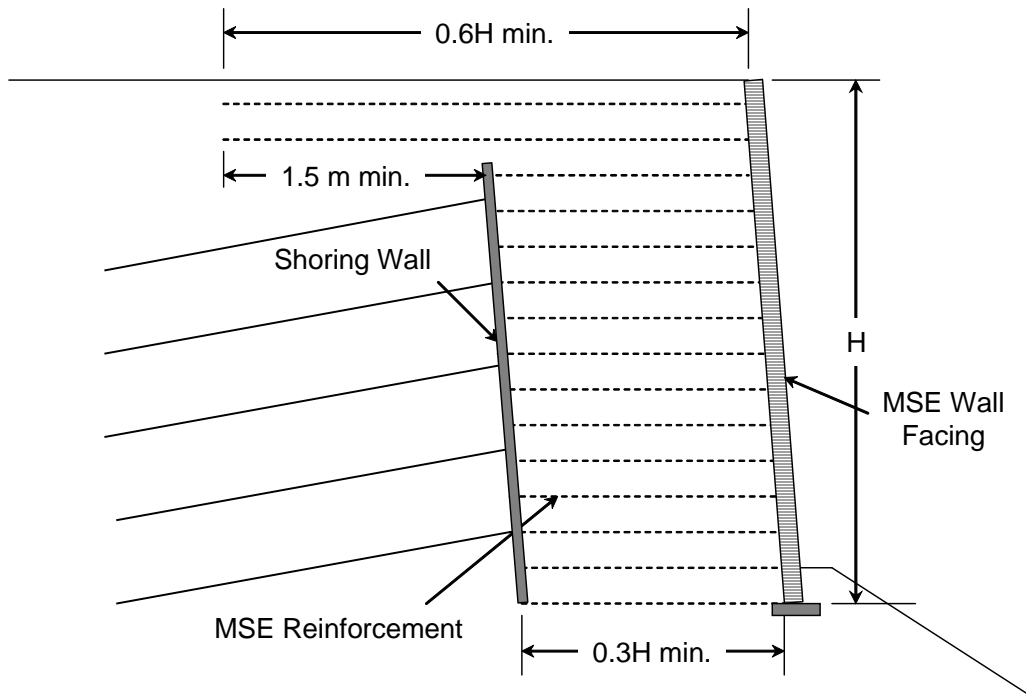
Diagram. Proposed geometry of MSE wall component of an SMSE wall system .
